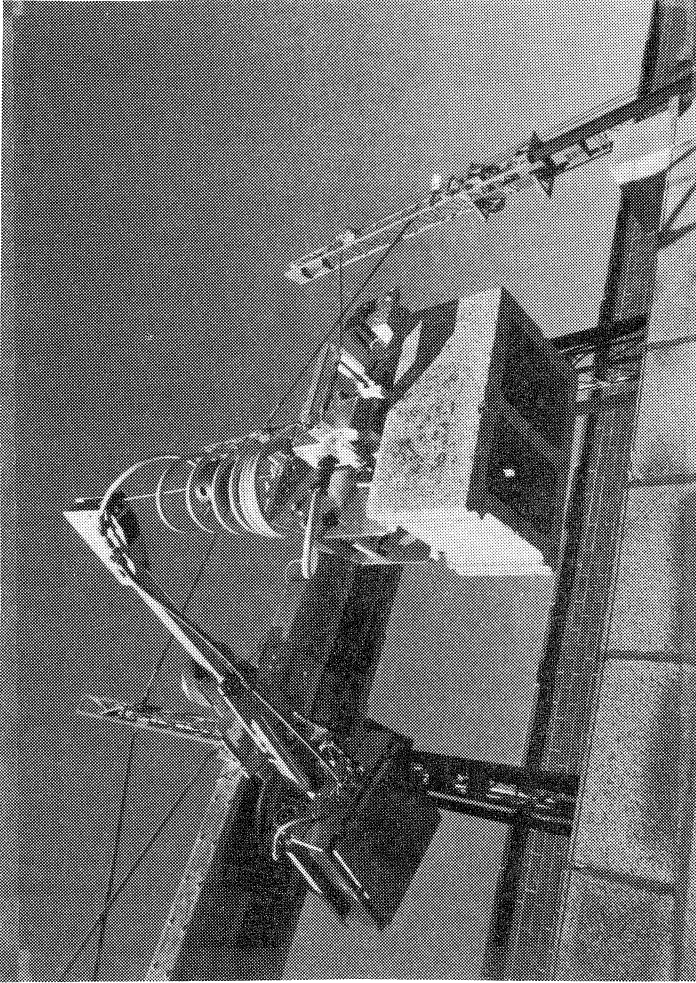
A close-up of MAMA's Hoist and Gripper Assemblies. The gripper, a prototype, is significantly larger than a production unit would be.
